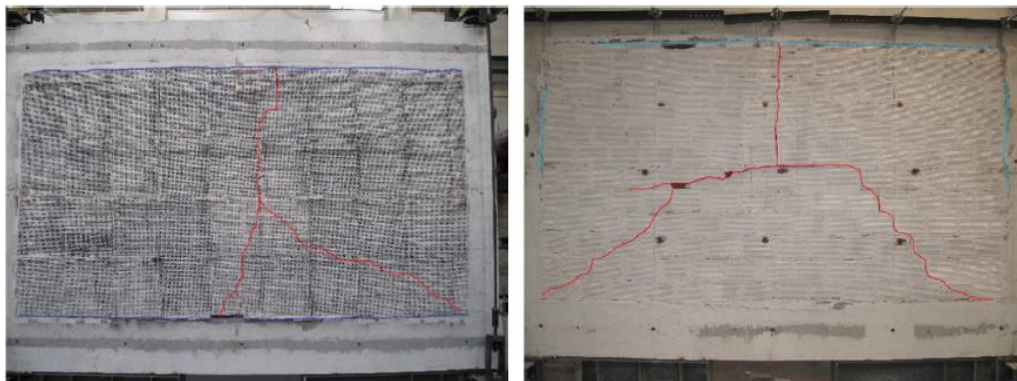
IP-undamaged Inf_01 (left) and Inf_02 (right) specimens by Furtado et al. (2016) at the end of tests.
